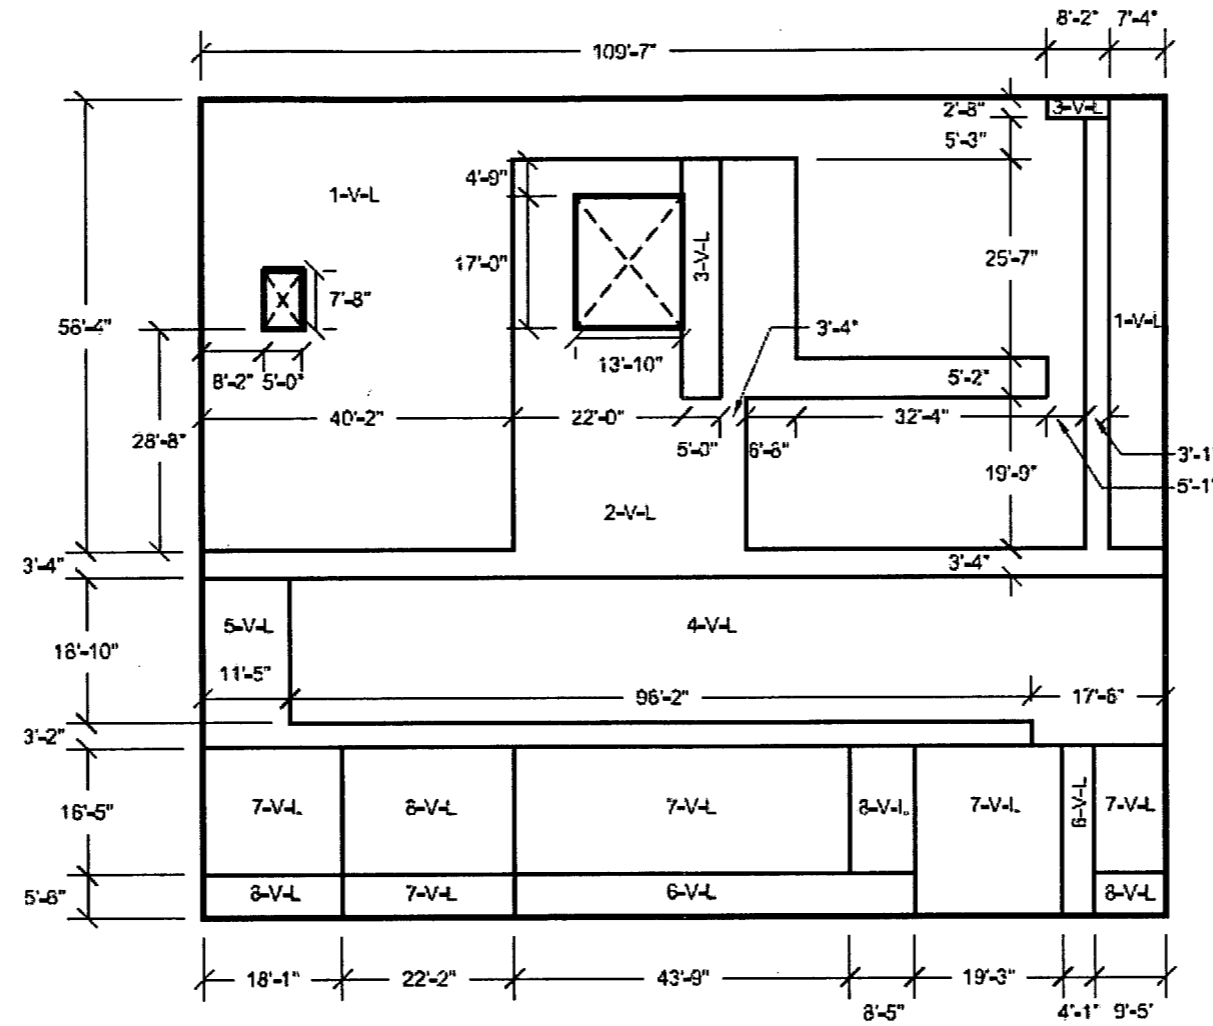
H.3-21: EAST WALL LOOKING WEST
